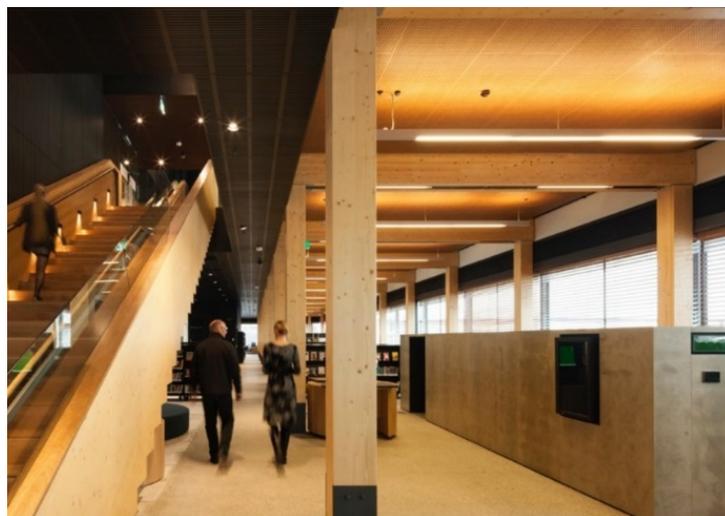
Fire designed exposed timber beams and columns at Library at the Dock, Melbourne
